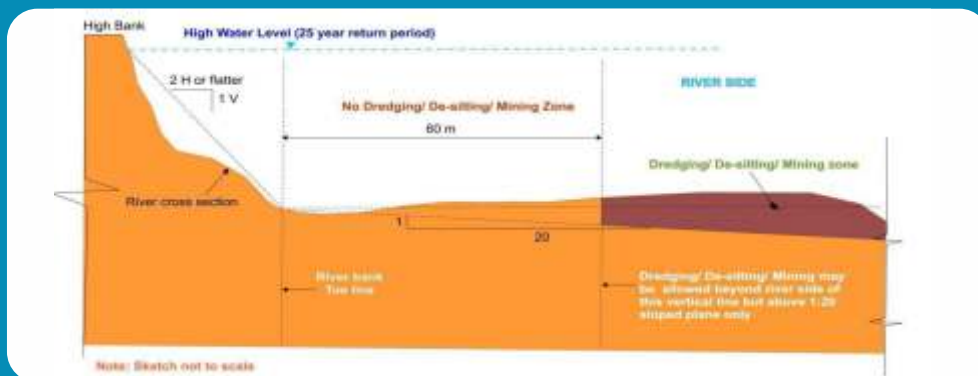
Typical Dredging / De-silting / Mining Restrictions for protecting natural river banks
